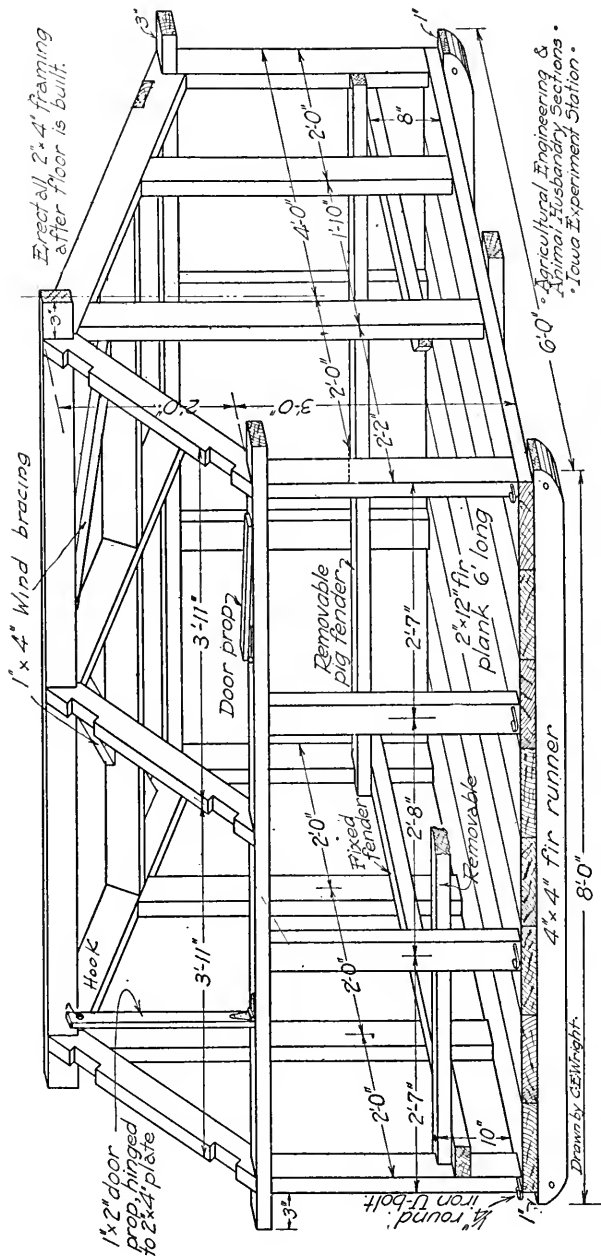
Ames Combination Roof House. Perspective showing framing details.
